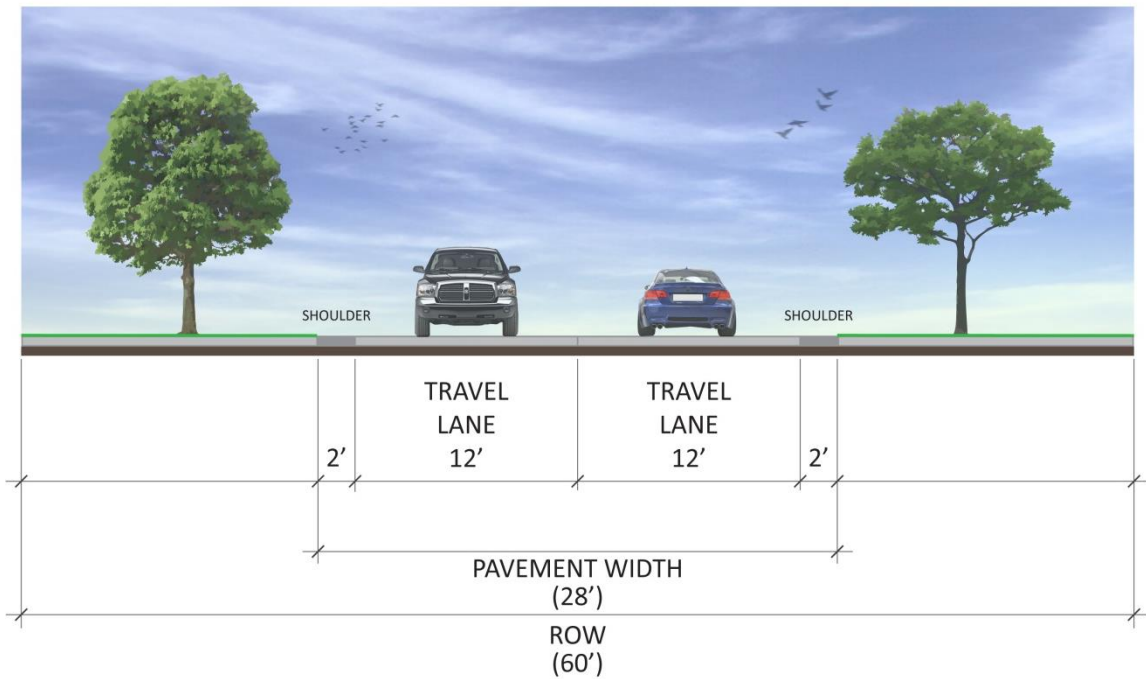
Rural Major and Minor Collector Street Cross-Section
